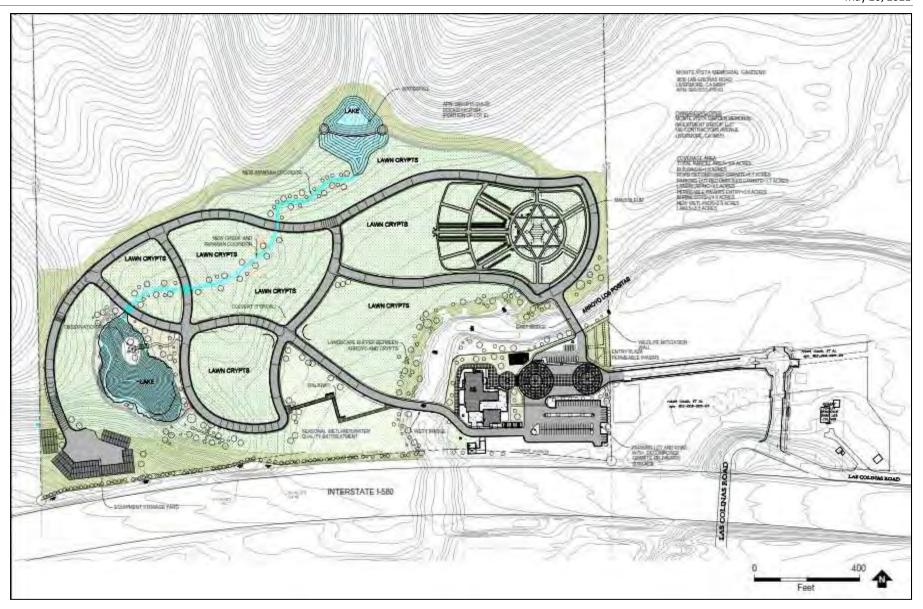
Preliminary Project Site Plan- Source: RCH Group (ENGEO 2020)
